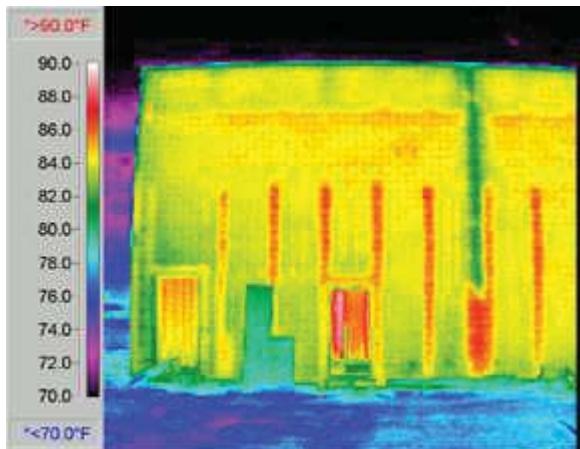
Thermograph of CMU wall section showing multiple deficiencies. (Pilasters are warmer.)
